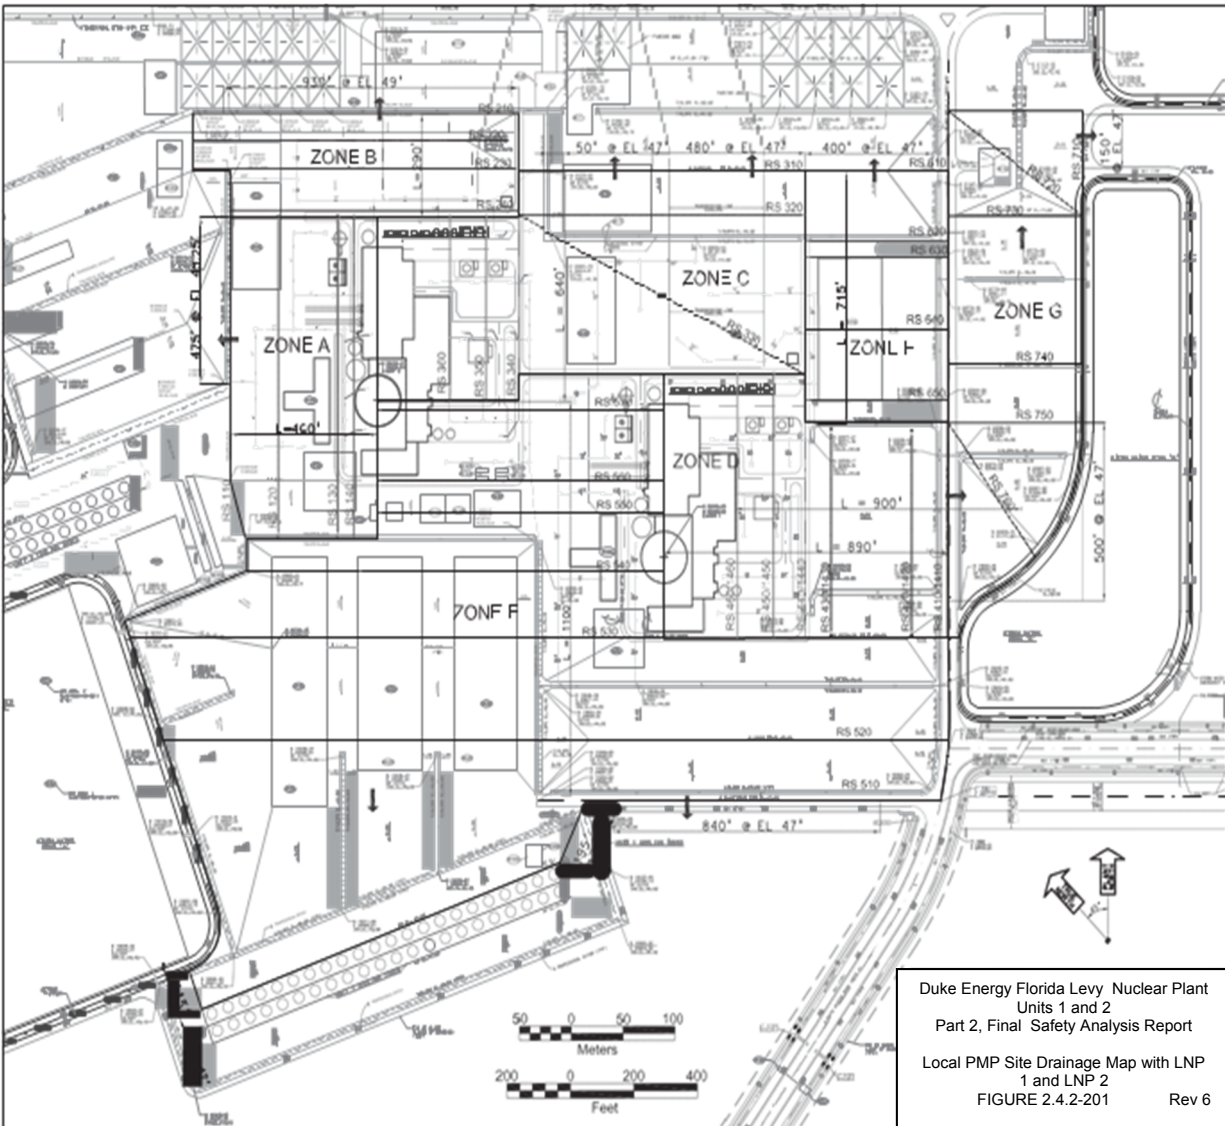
Local PMP Site Drainage Map with LNP 1 and LNP 2
